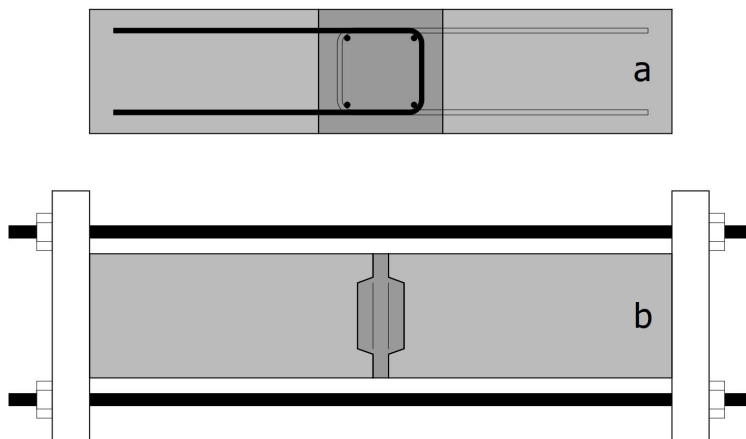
Examples of connections in specimens with "Internal" (a) and with "External" (b) reinforcement
